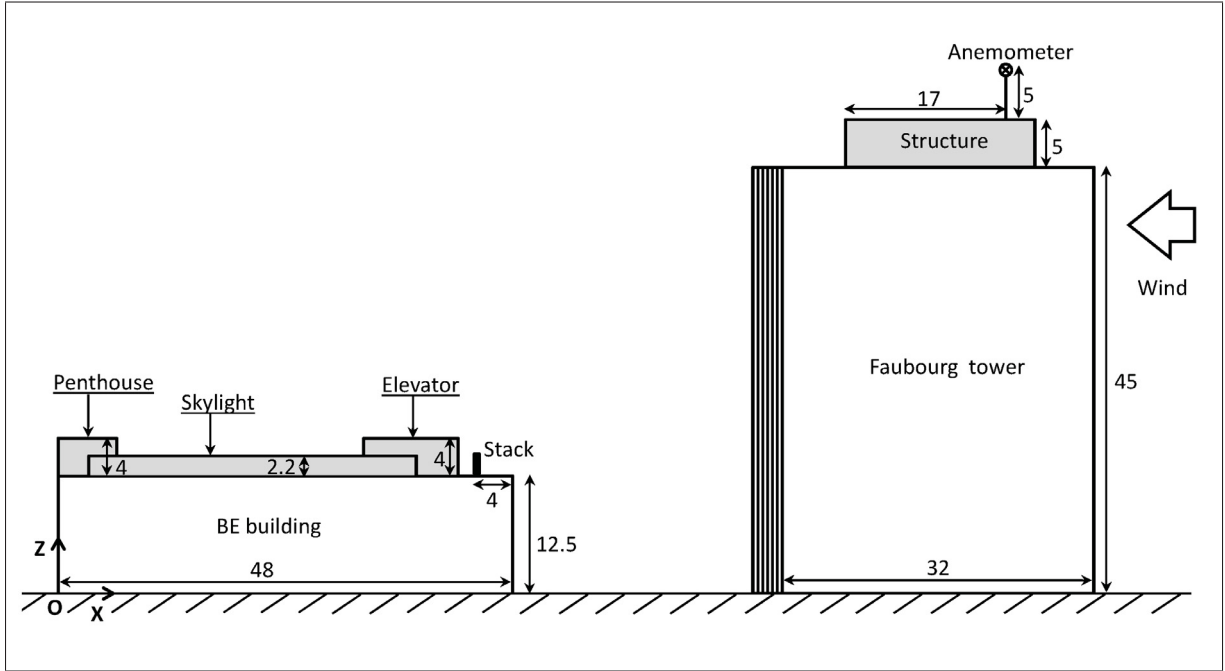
Elevation view of the BE building and Faubourg tower. All dimensions in [m].
